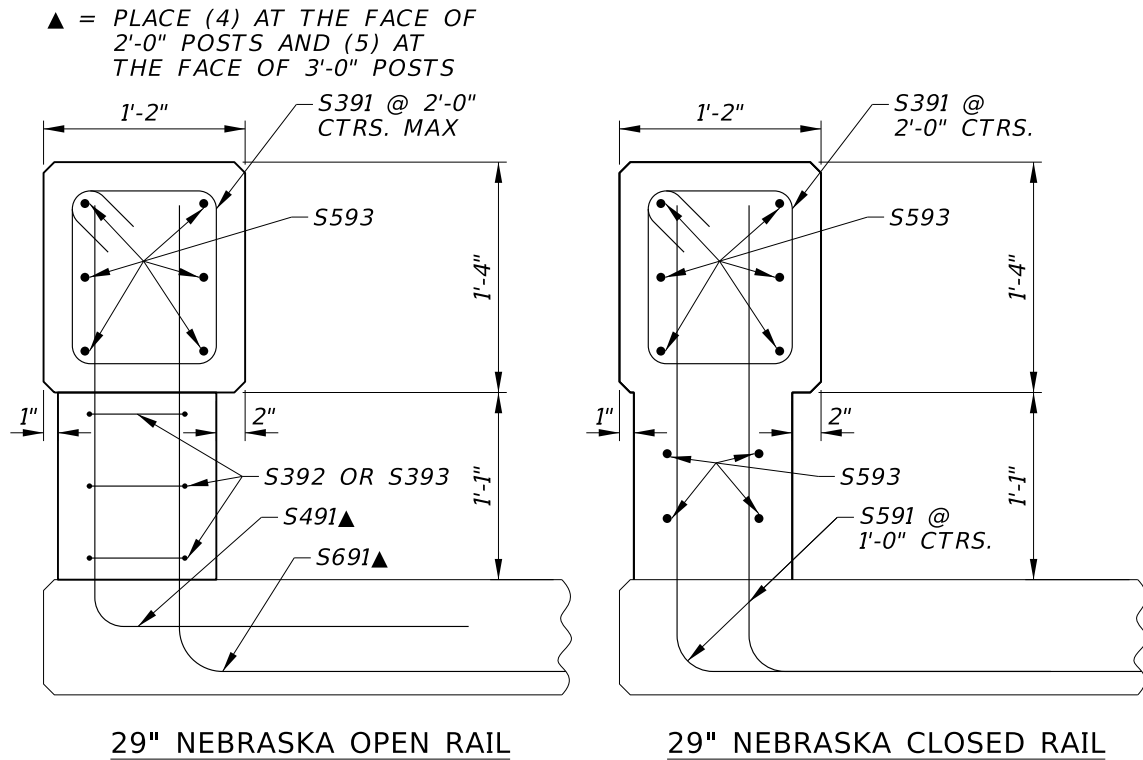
29 in. Nebraska Rail Reinforcing Sections
